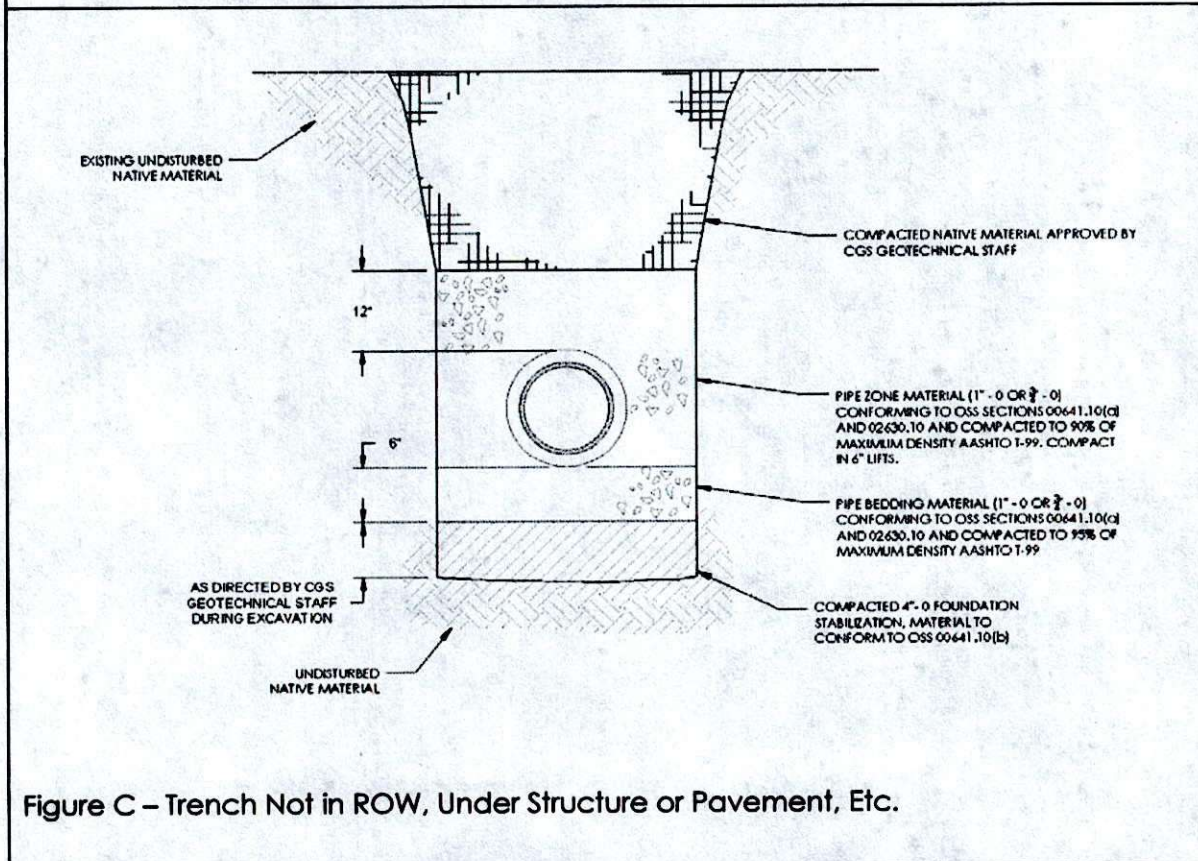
Figure C – Trench Not in ROW, Under Structure or Pavement, Etc.
